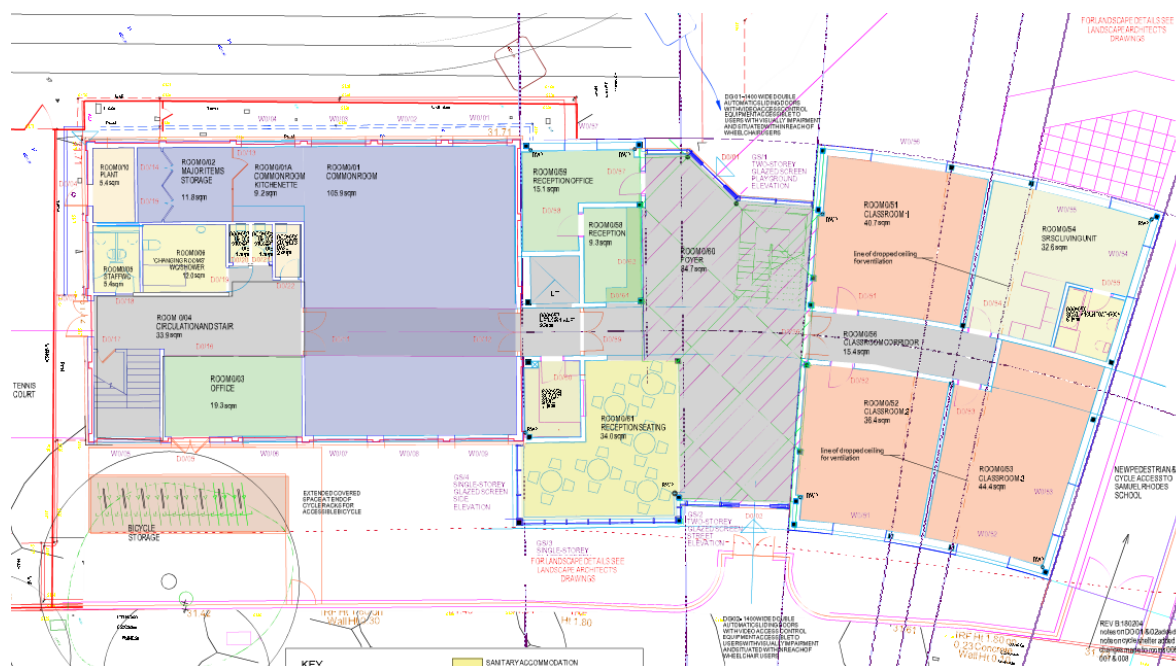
Proposed Ground Floor Plan showing difference in building line (3.5m)
